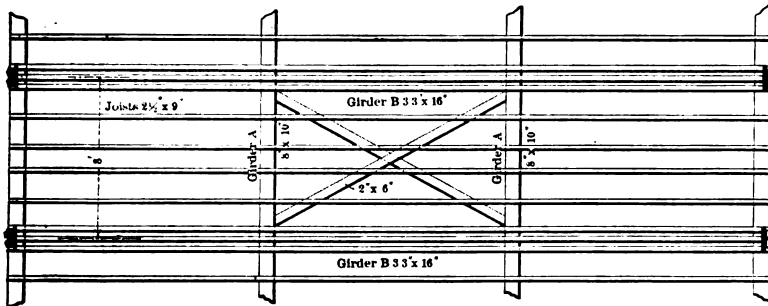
Showing System of Flooring Employed.—Scale, 1/4 Inch to the Foot.
